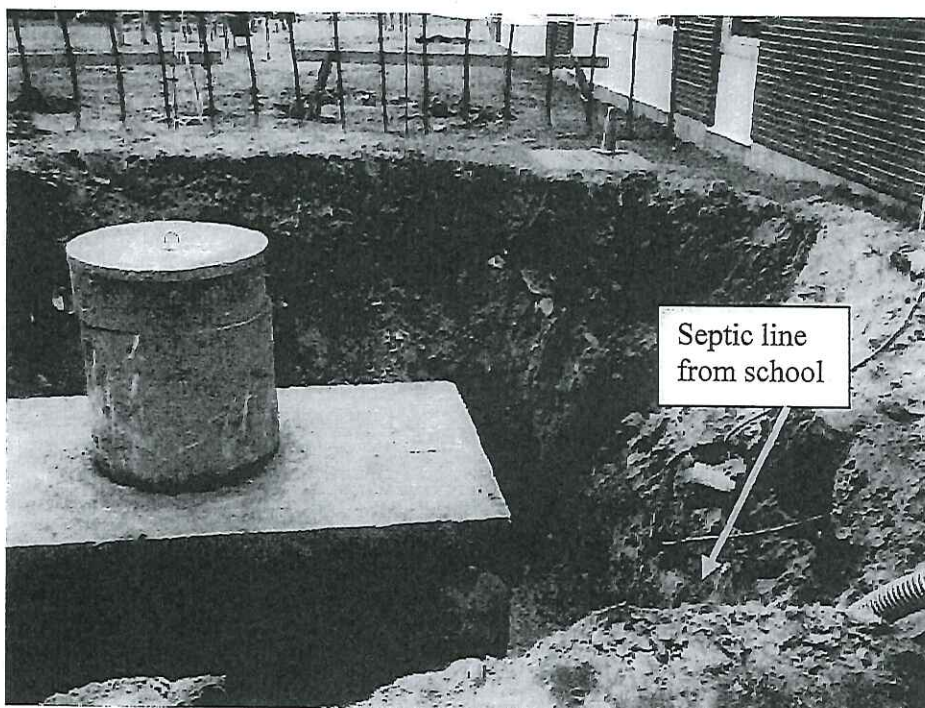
Septic Tank where contaminated soils were excavated and removed from the site.
